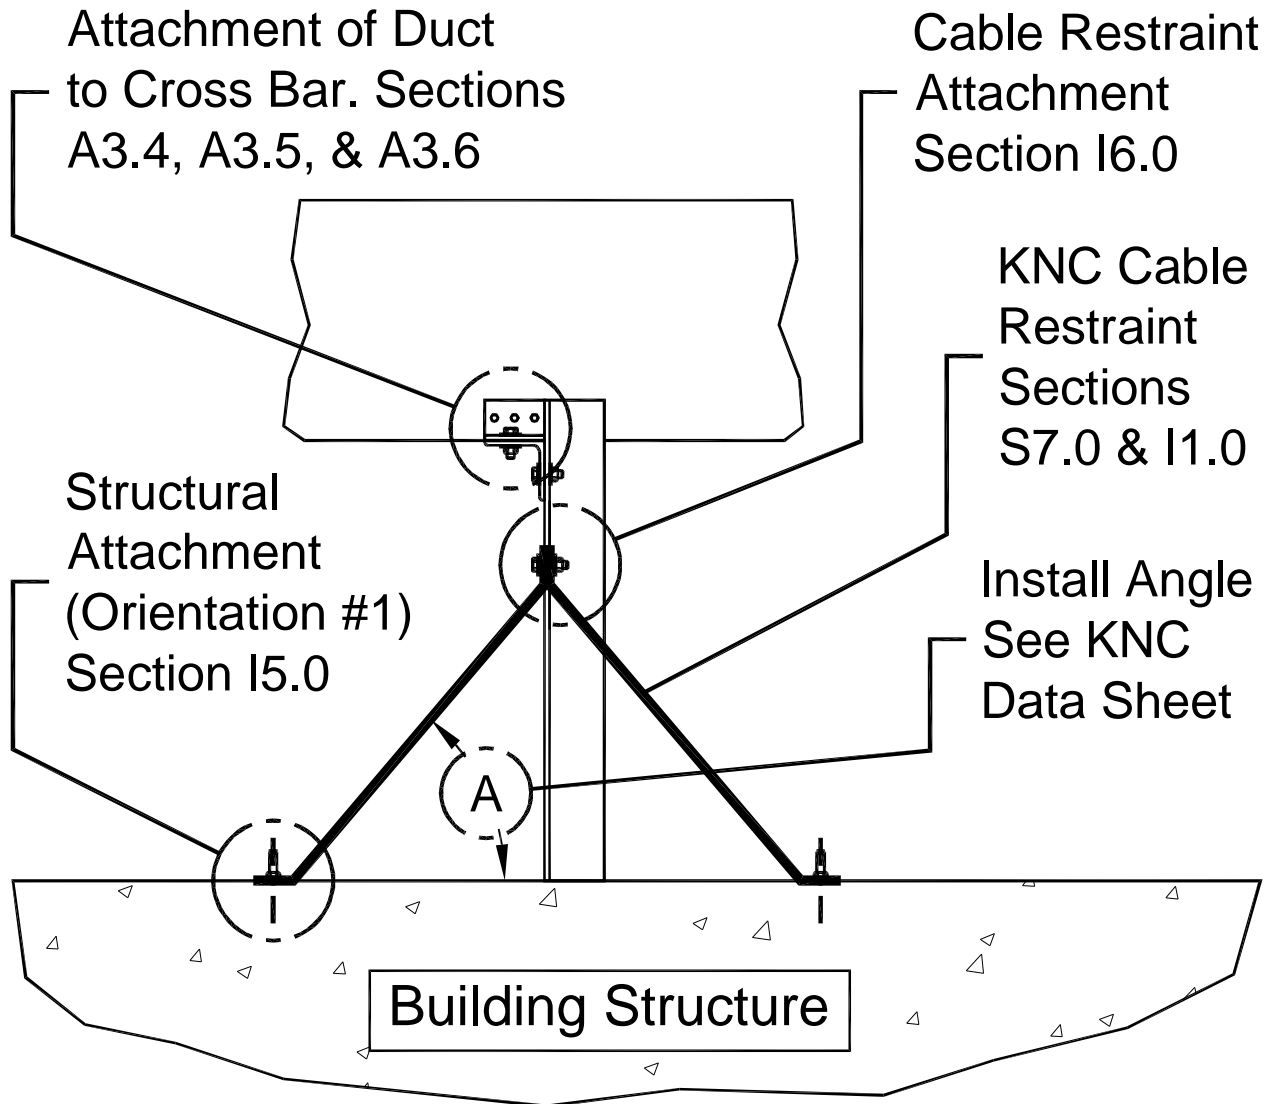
; Longitudinal (L) Cable Restraint Schematic Arrangement for Floor or Roof Mounted Duct – Restraints Attached to the Floor Stand or Support
